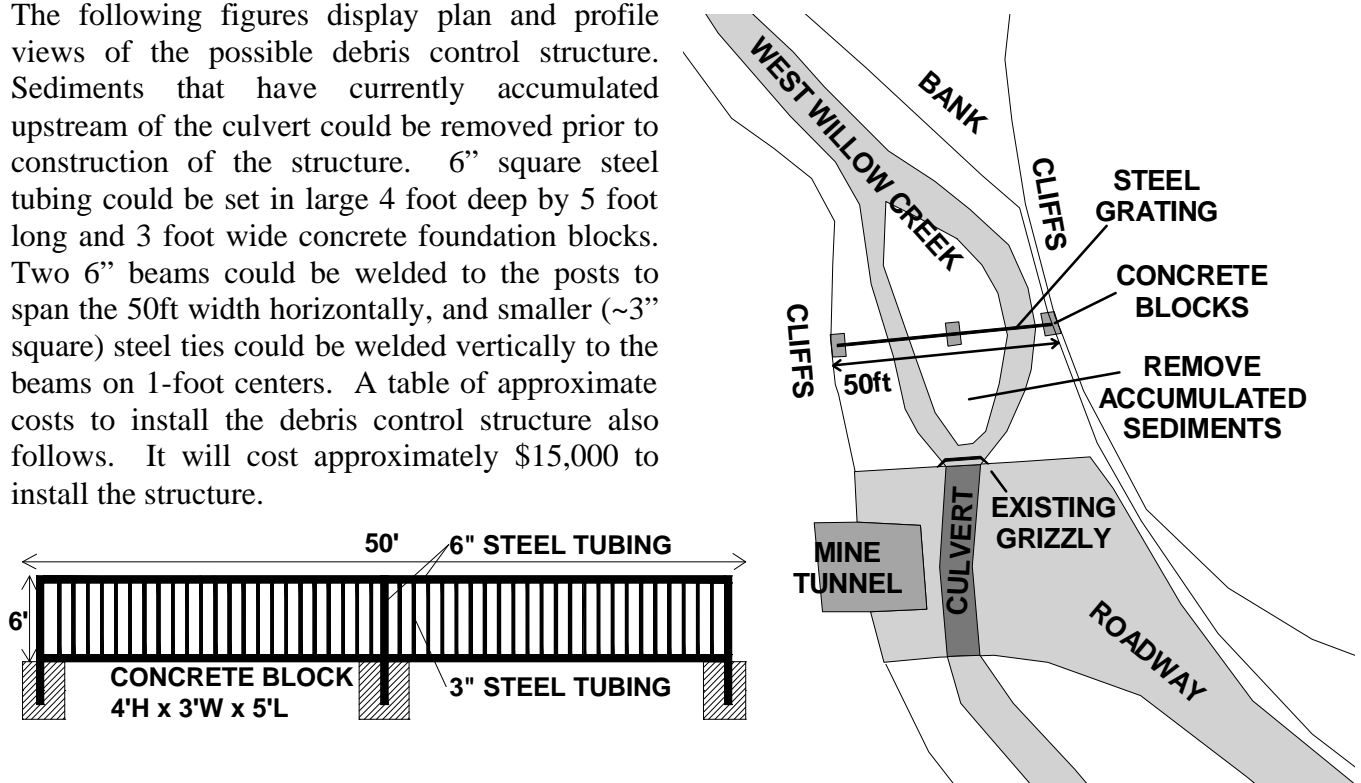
Plan (right) and profile (left) views of Amethyst debris control structure
